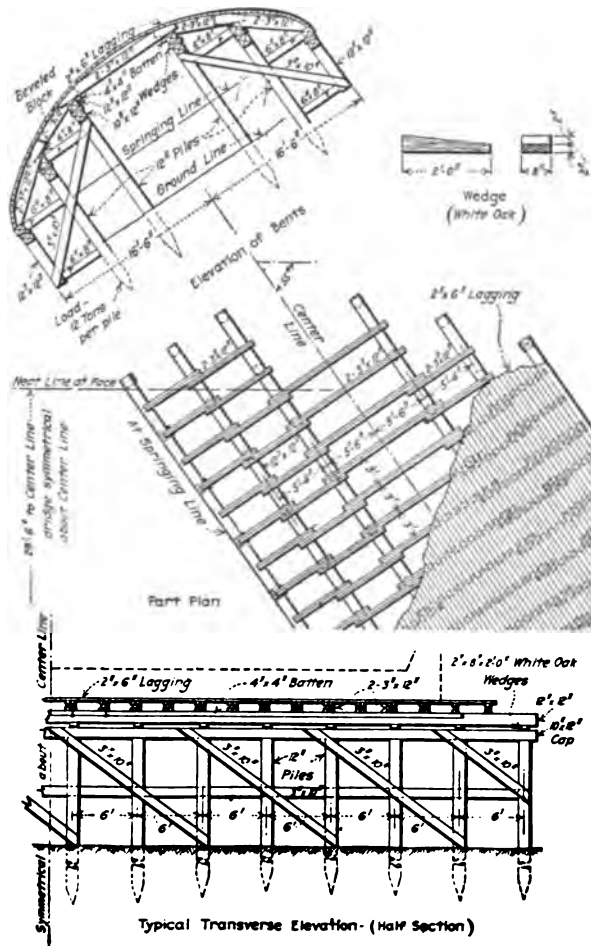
Details of arch centers for proposed renewal, C. R. R. Co. of N. J.
